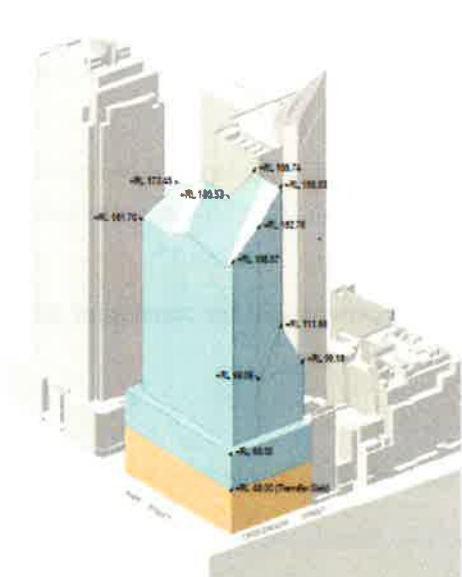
| Proposed building envelope with approved Metro station in yellow (Source: Applicant's EIS).
